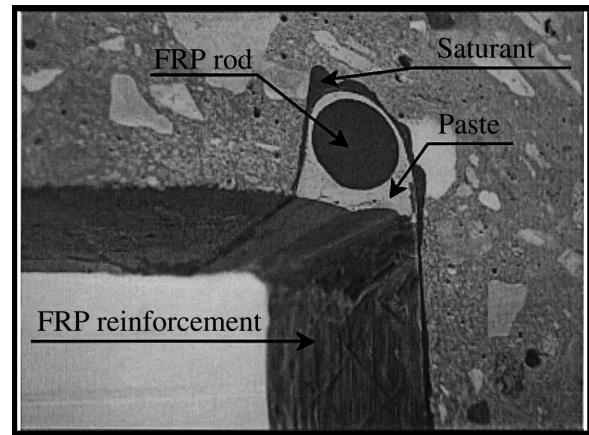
Details of the U-anchor obtained by slicing a beam.
